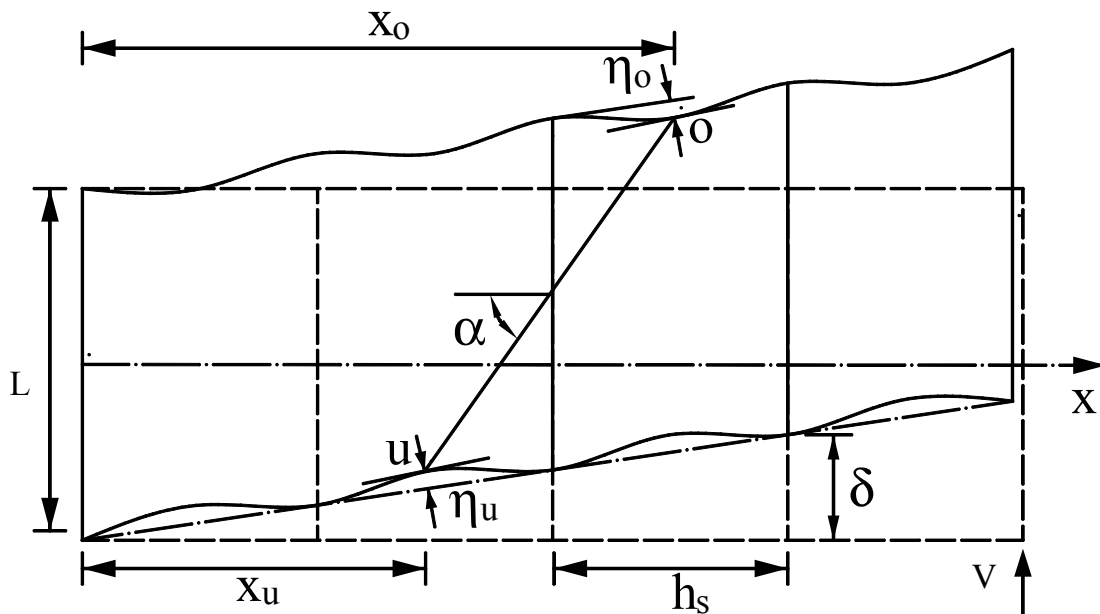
Deformation of a Cantilever Plate Girder under Transverse Load (Adapted from Wagner 1931)
